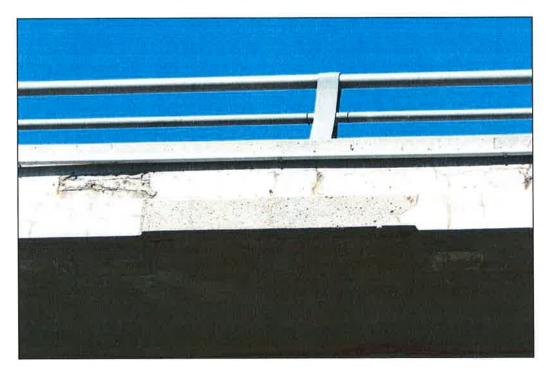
Typical Condition of Fascia (Bent 85-86) (fair condition –cracking, isolated delaminations and patches)
